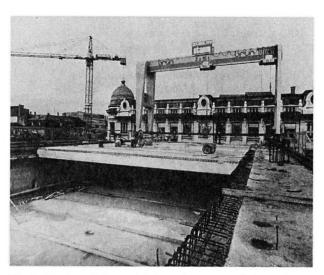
Placing of the prefabricated prestressed elements between the main girders
